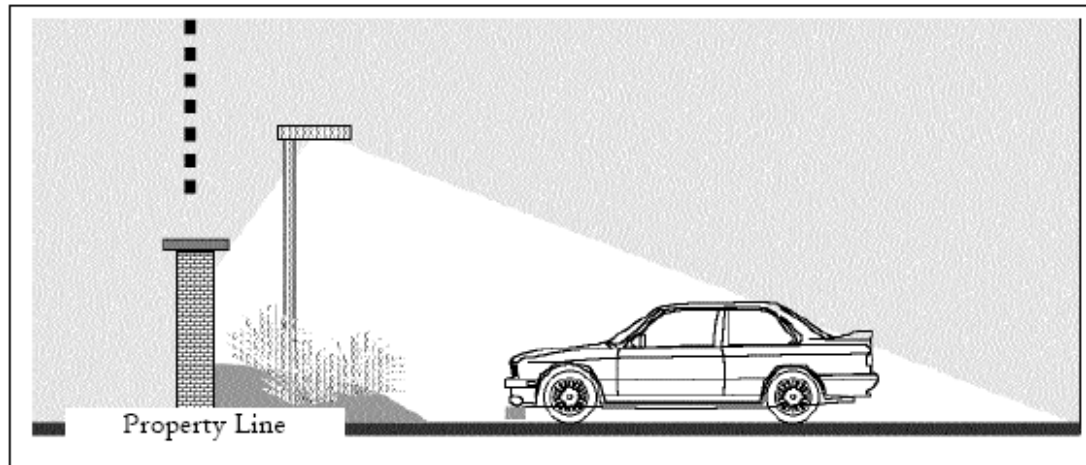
FENCE AND WALL HEIGHT
